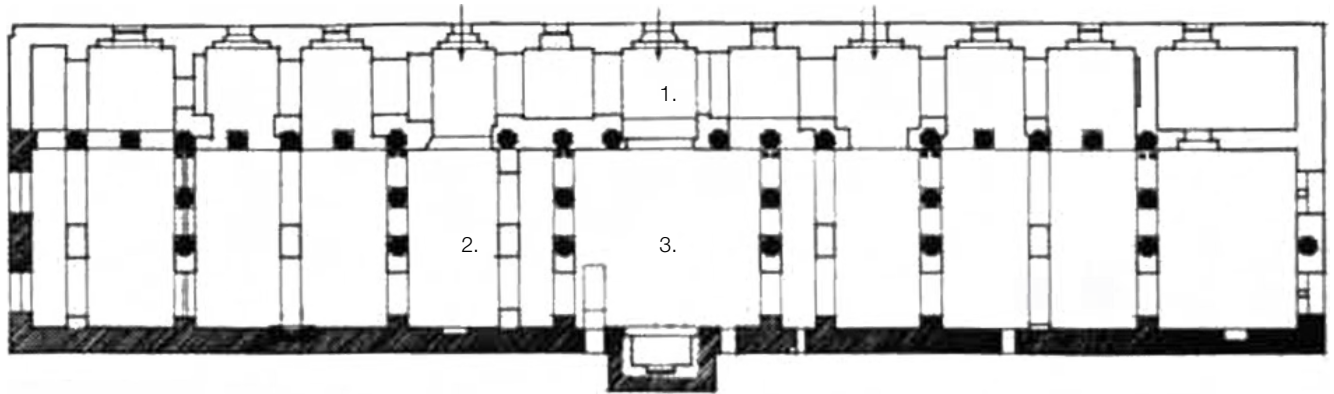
Layout plan of Al Nouri Mosque Complex and layout plan of the Prayer Hall at the beginning of the 20th century, 1920.
